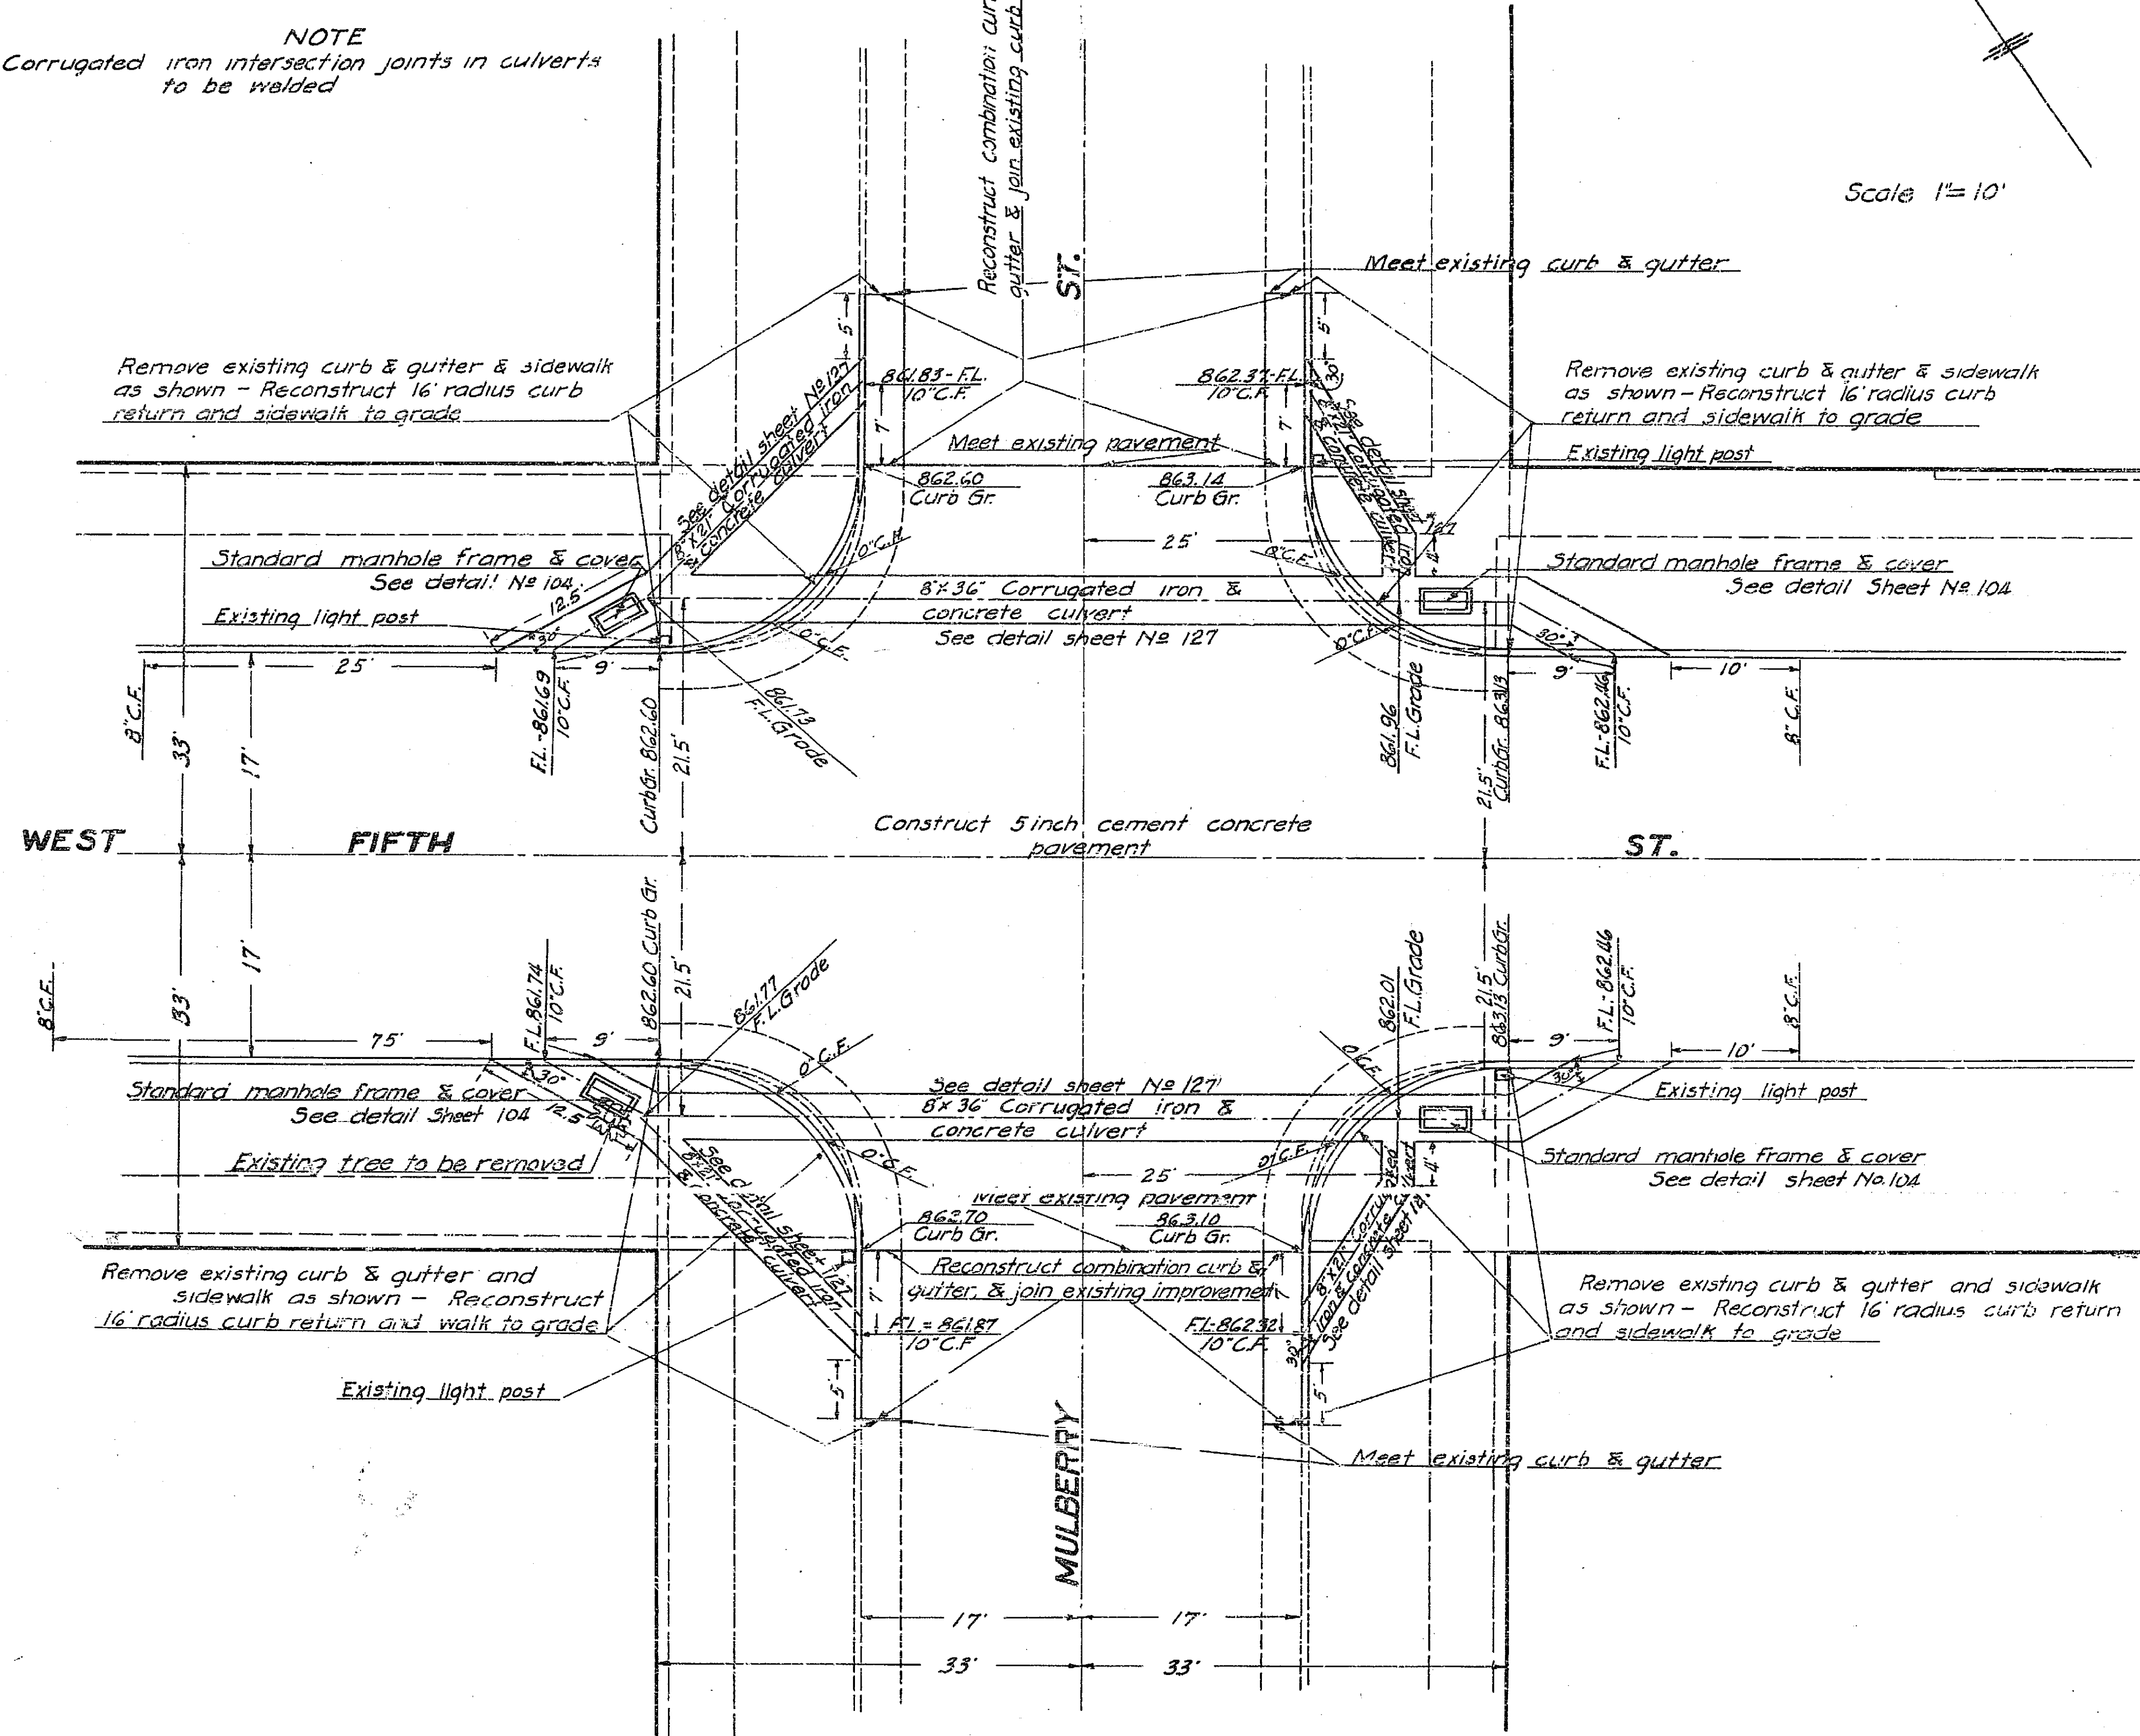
# DETAILS OF INTERSECTION OF WEST FIFTH STREET AND MULBERRY ST.
